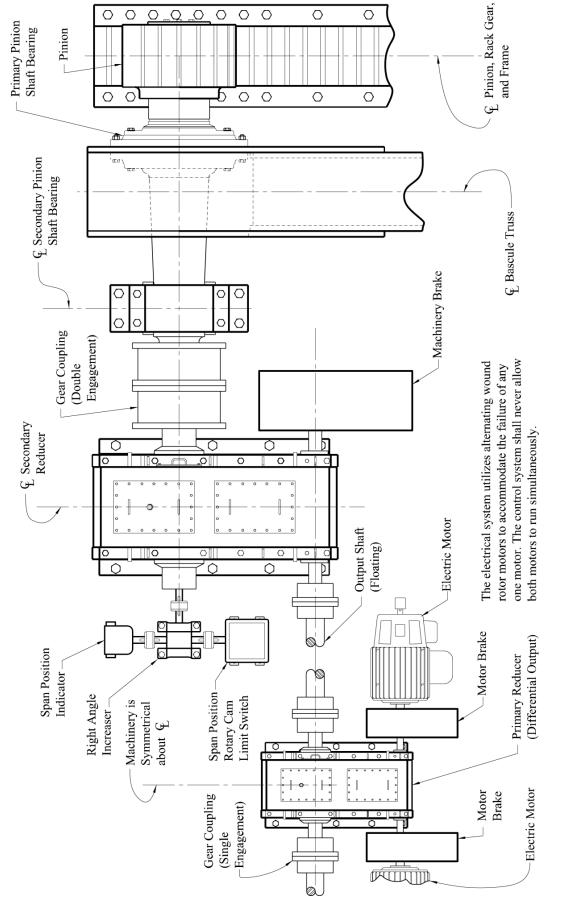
Span Drive Machinery Layout for a Rolling Lift Bascule Bridge
